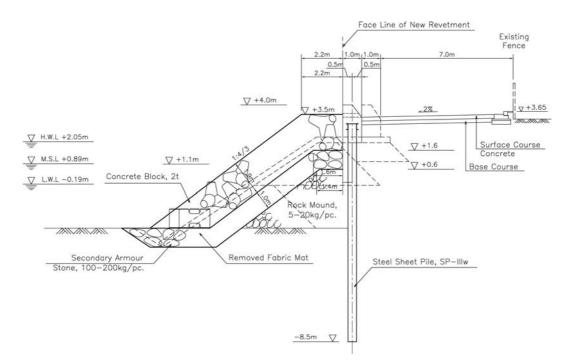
Typical Cross Section of the New Wharf Revetment
